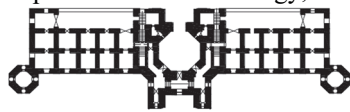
Drawing of first-floor plan of Bara Katra (Source: Department of Archaeology, Bangladesh)
